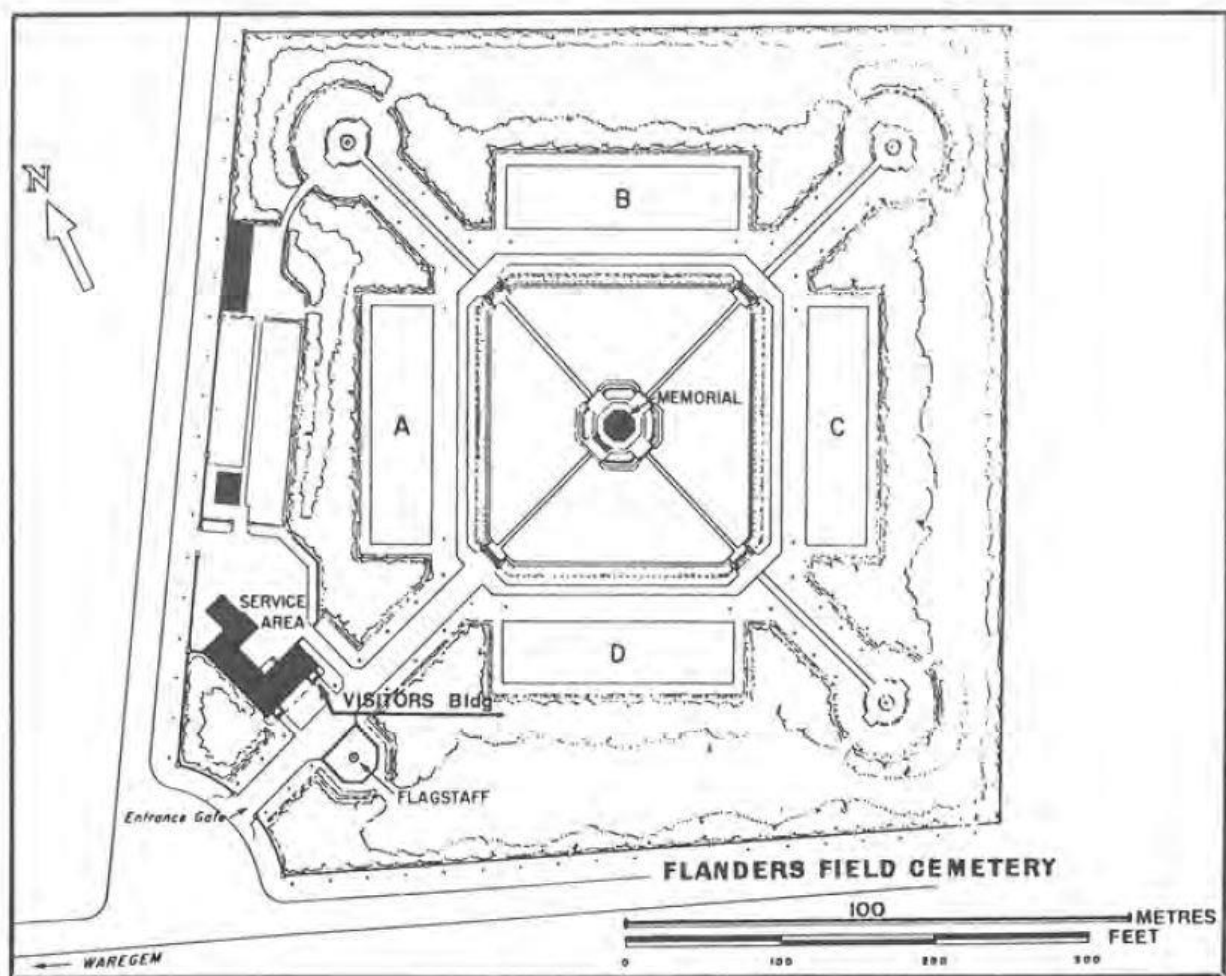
Design layout of Flanders Field Cemetery from site booklet (ABMC n.d.-g)
